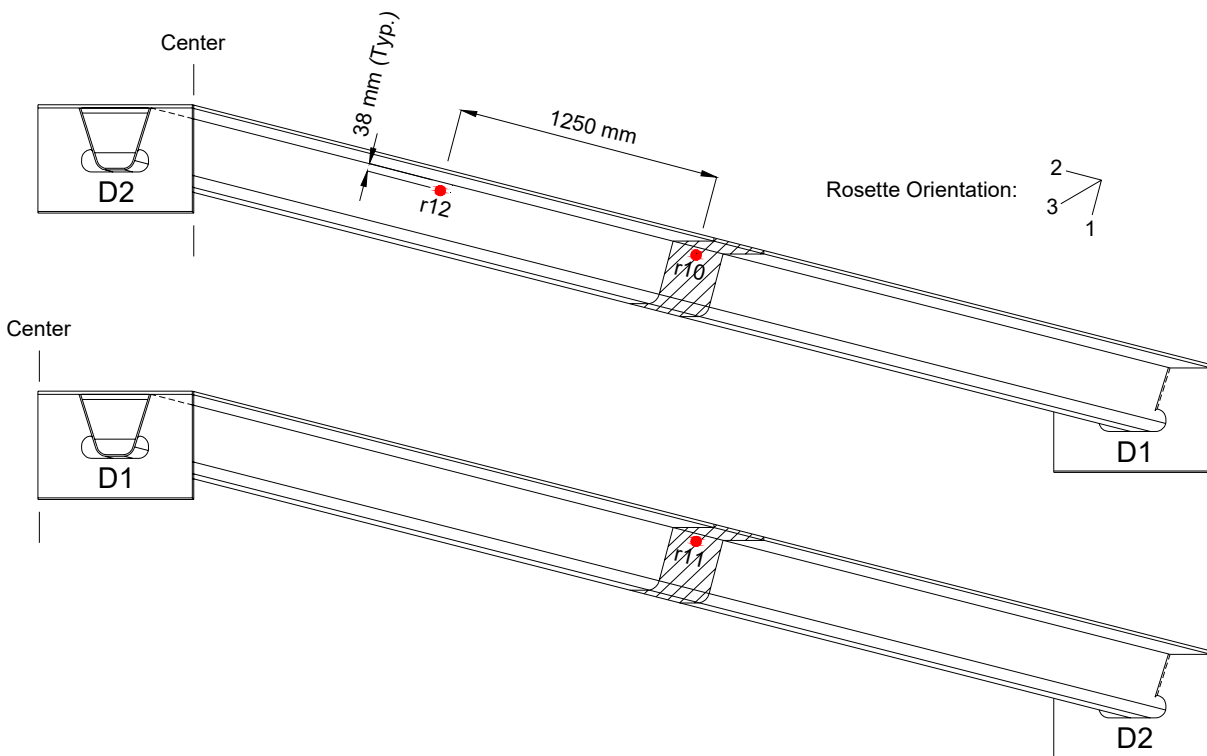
Specimen 4: Strain Gages in Inner Surface of Rib R3 near Rib-to-Deck Welds
